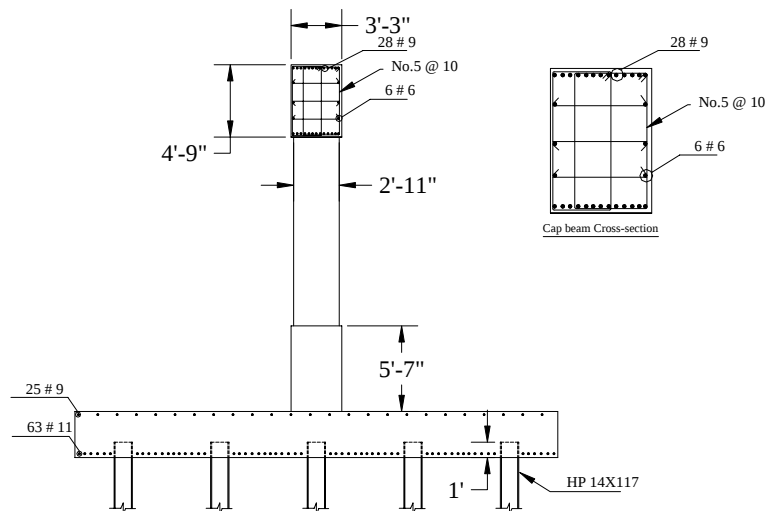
Reinforcement details for Footing and Cap beam (Side view)
